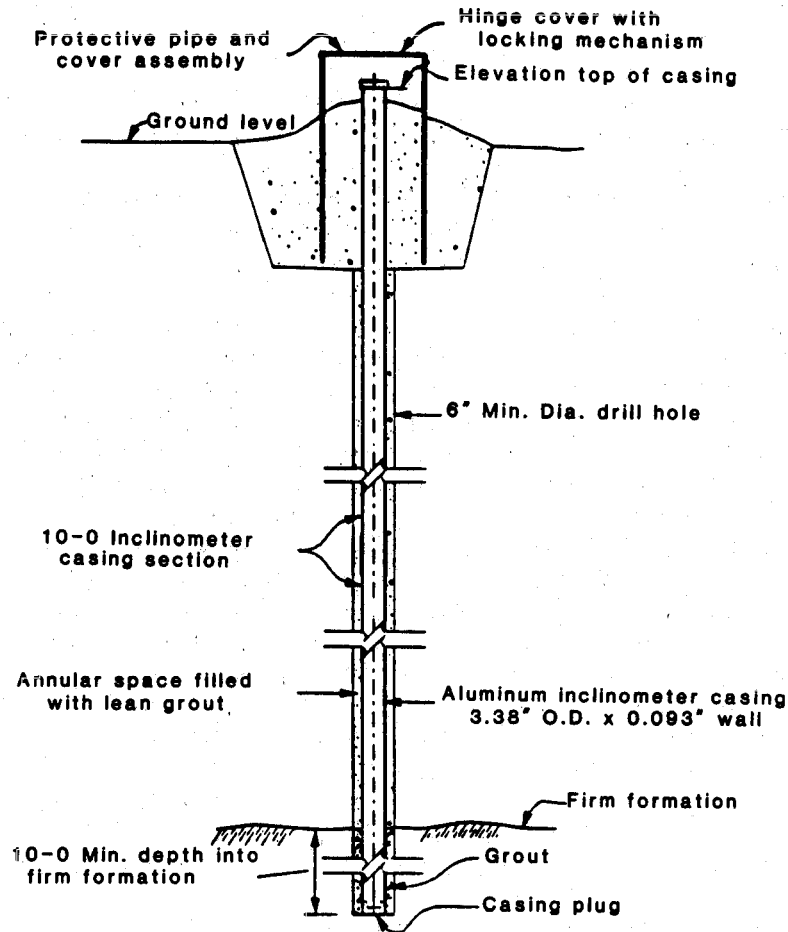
Typical foundation and abutment inclinometer installation.
